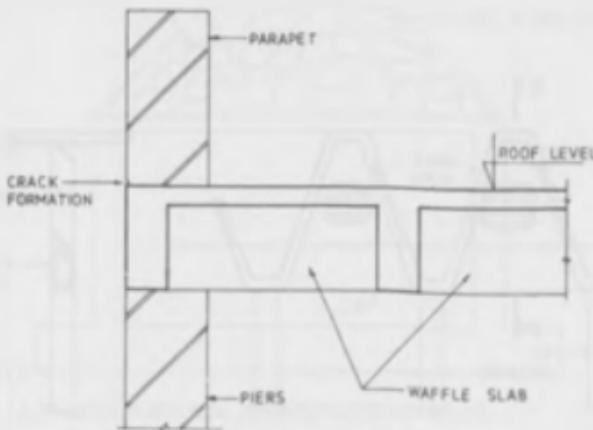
Cracks in supporting brick piers of an auditorium roof.
